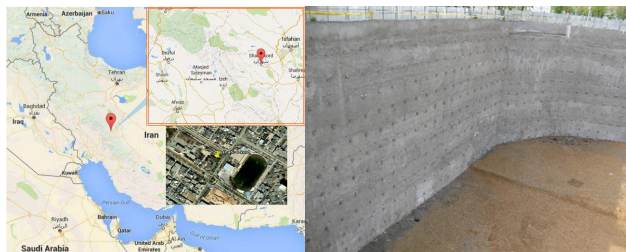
Site location (red balloons) and a view of nail-stabilized walls
